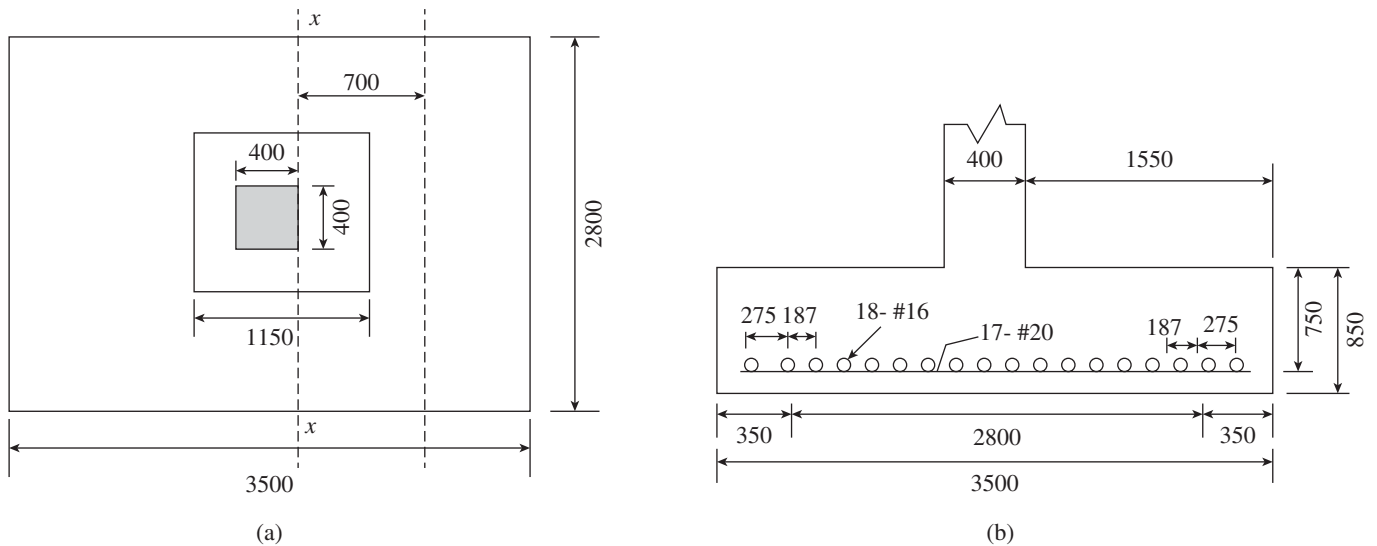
Rectangular footing of Example 15.4 (a) Plan (b) Section
